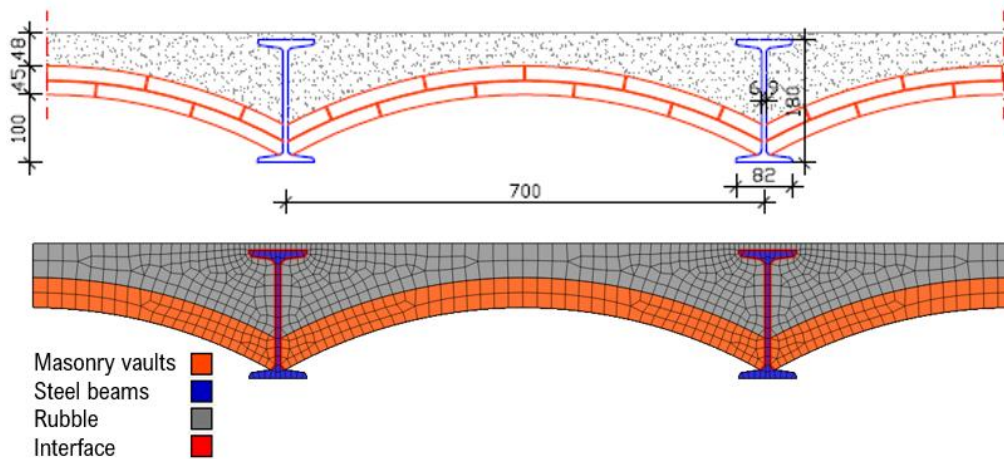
Section of the jack arch floor with steel beams and tile barrel vaults: Geometry (top) and finite element model (bottom) (dimensions in mm).
